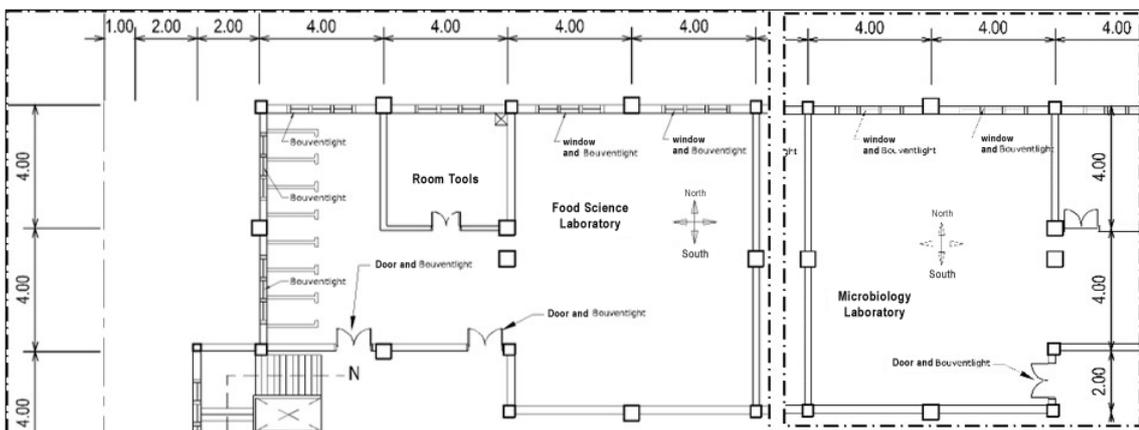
Layout Plan of the Measured Laboratory Room 1
